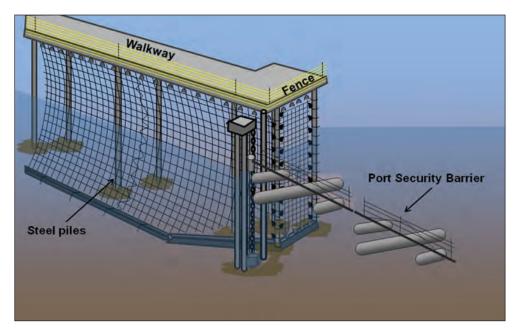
End view of the Pile-Supported Piers and Port Security Barrier Modifications Alternative 2.
